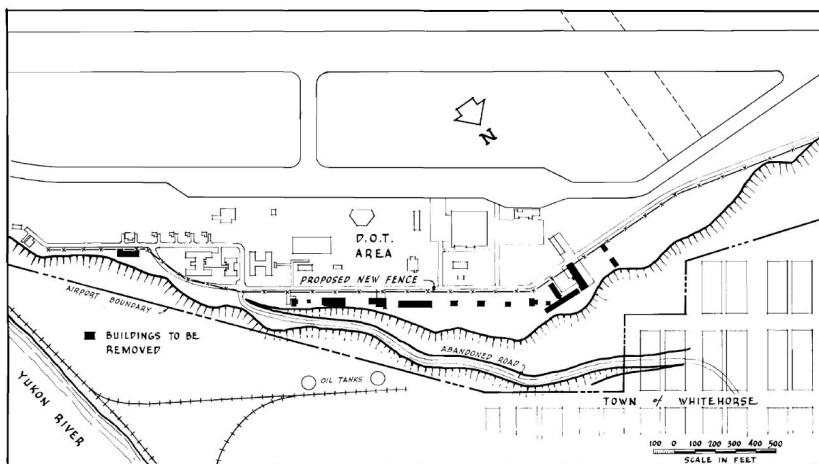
PLAN SHOWING LOCATION OF PROPOSED PROTECTIVE FENCE AND BUILDINGS TO BE MOVED
